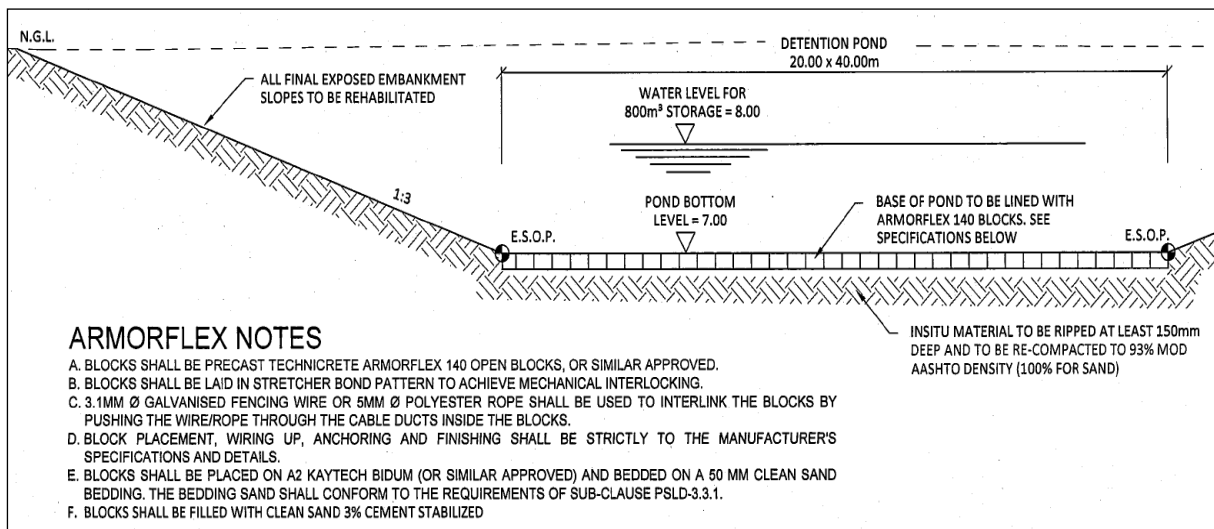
Detention Pond Armorflex Lined Bottom Detail (Including Armorflex Notes)
